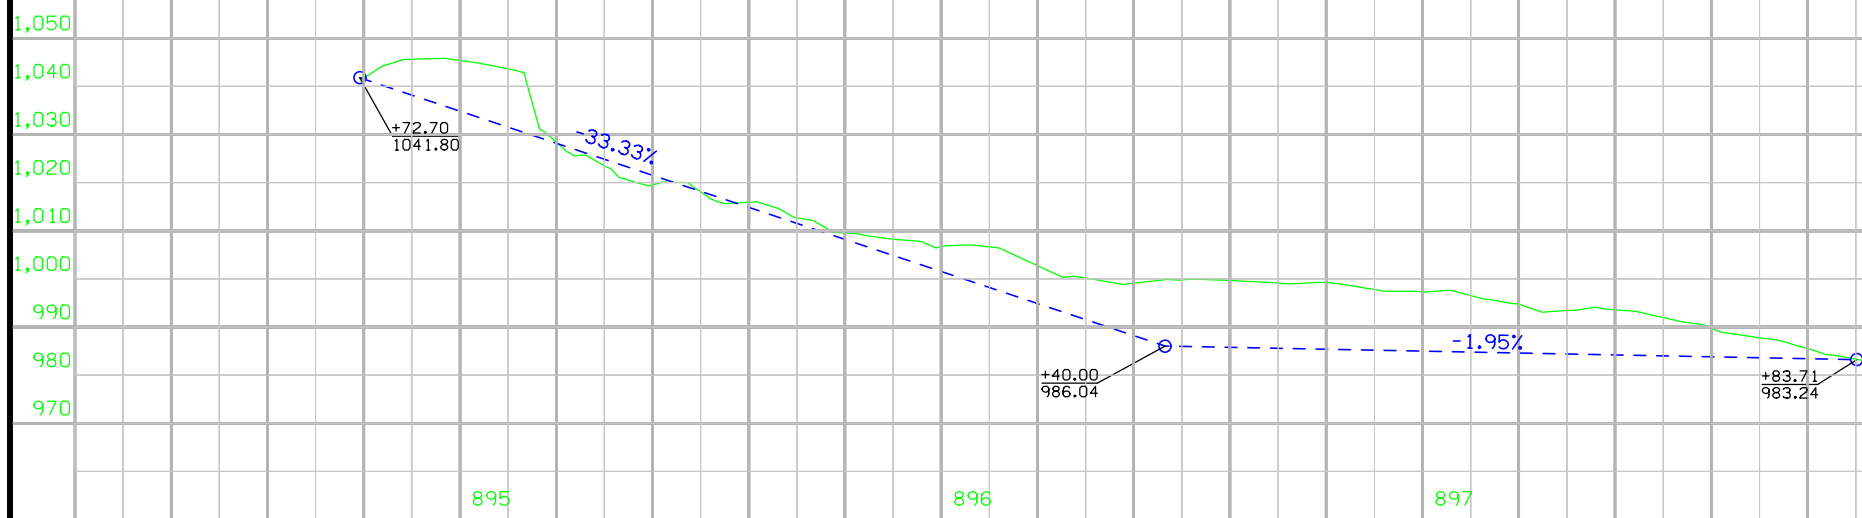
PLAN - PROFILE & R.R.E. STANDARD
